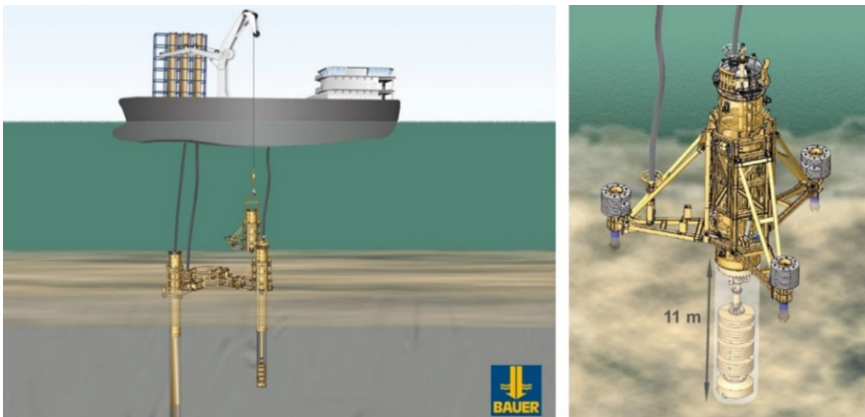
Seabed templates and drilling rigs for drilled and grouted piles operated by Bauer Renewables.
